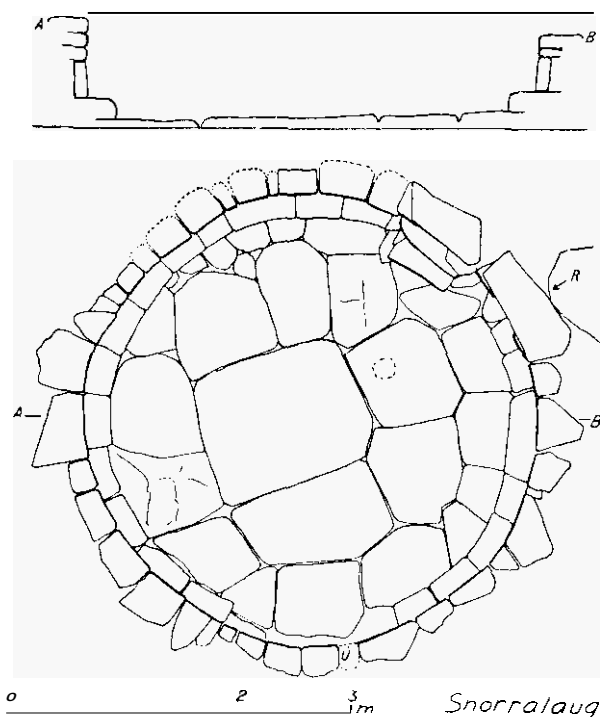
Plan and cross section of Snorrallaug (Snorri's bath) before the restoration in 1959. R: Inflow of water from a 120 m long underground conduit; U: Outlet for water (from Grimsson, 1960)
